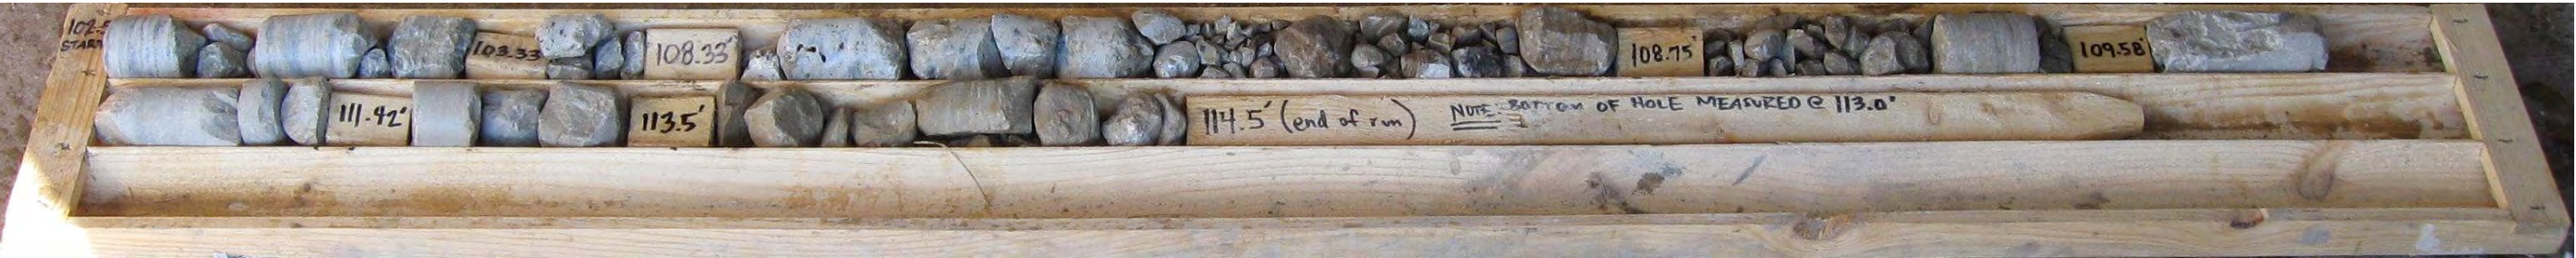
Borehole No. 107 – Rock Core. Elevation 155.17 metres to 150.95 metres.
